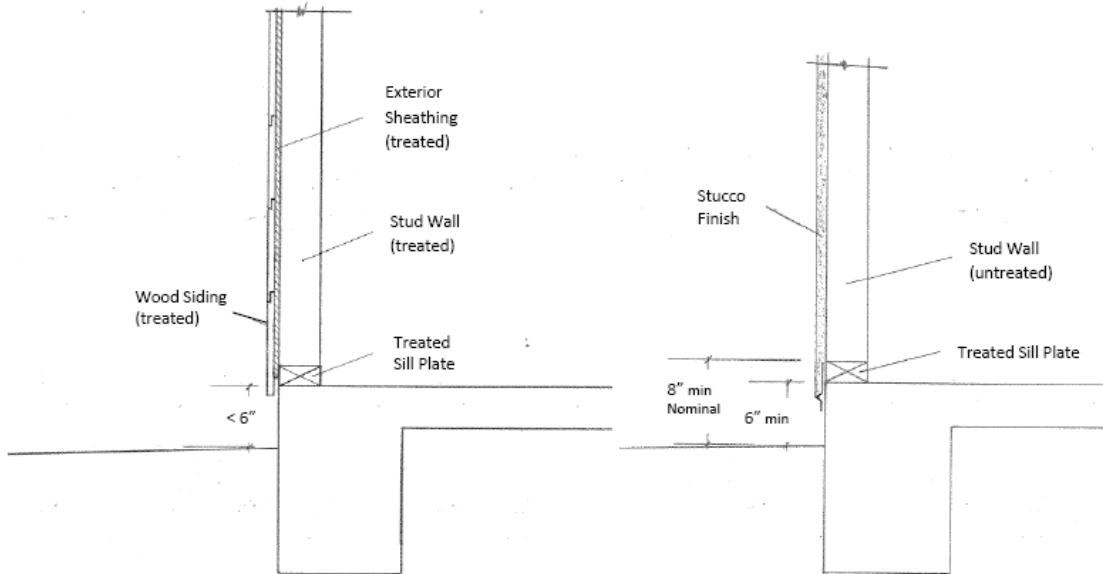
Wood Siding less than 6" from Earth (section 2304.11.2.6)
